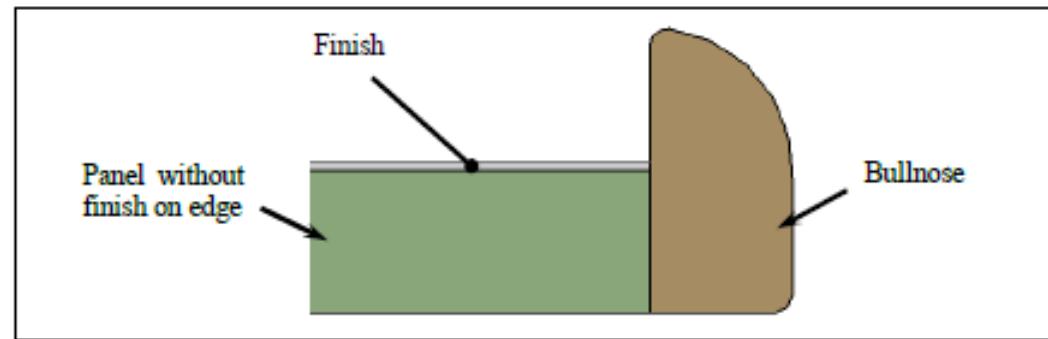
REMOVABLE FIX SHELF FINISH
